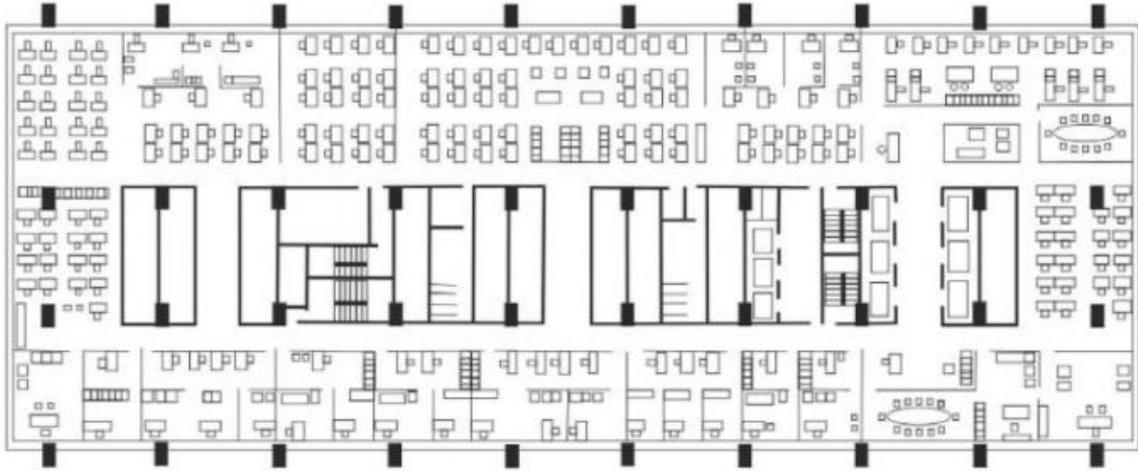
Example of open plan in the Chase Manhattan Bank (Lovell, n.d.)
